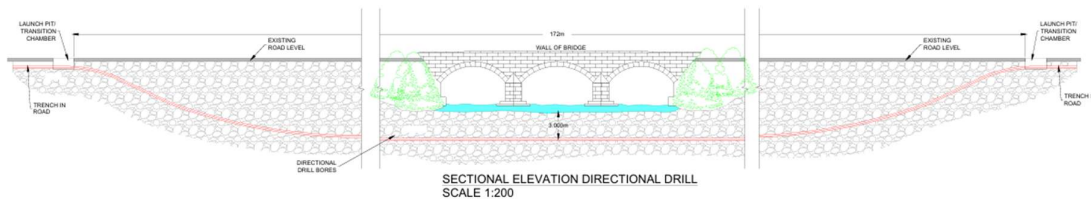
New Bridge crossing River Cushina (County boundary between Offaly and Kildare).
